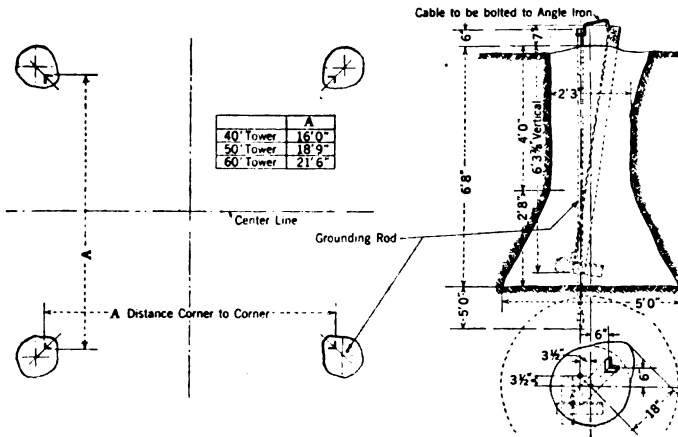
MUSHROOM TYPE CONCRETE FOUNDATION FOR HEAVY TOWERS
